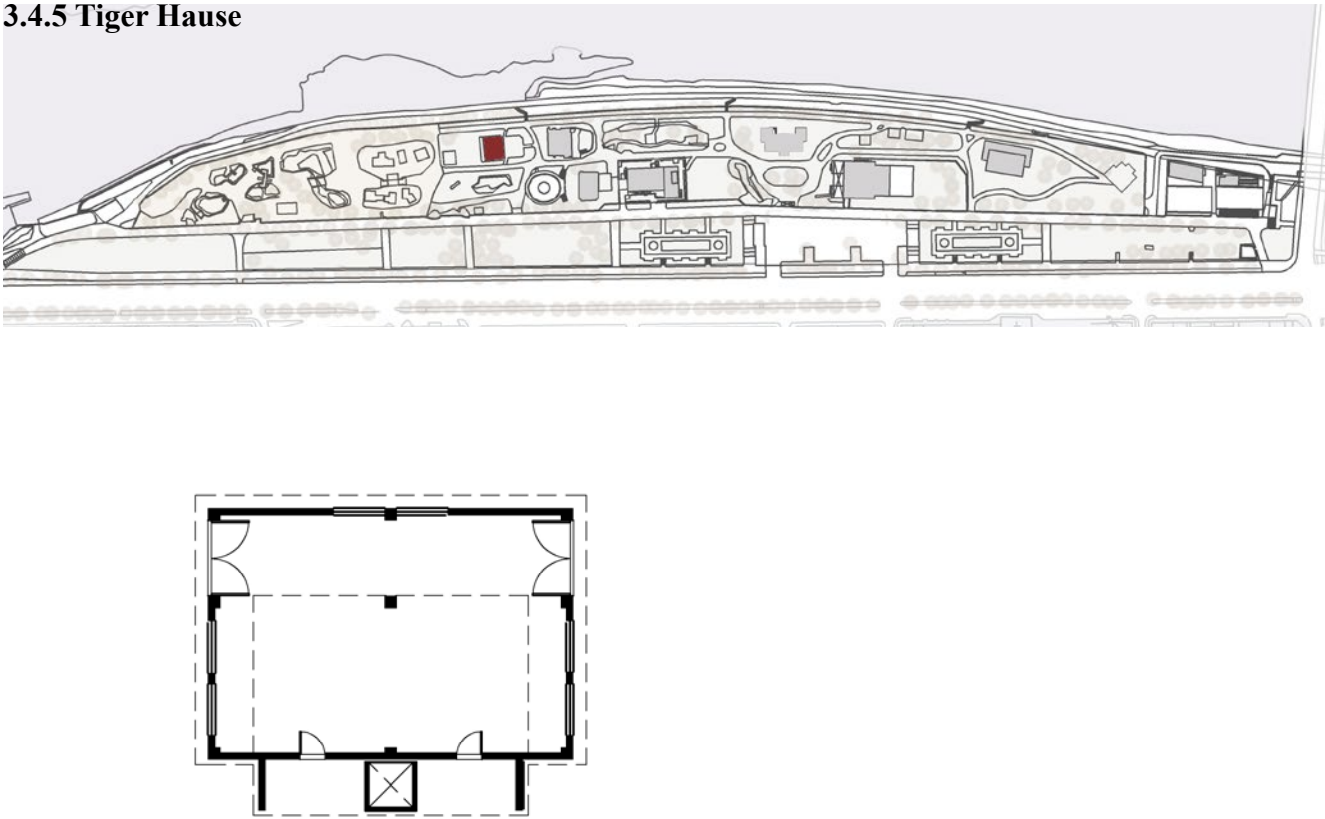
Ground Floor Plan and Section, drawn by the authors.
